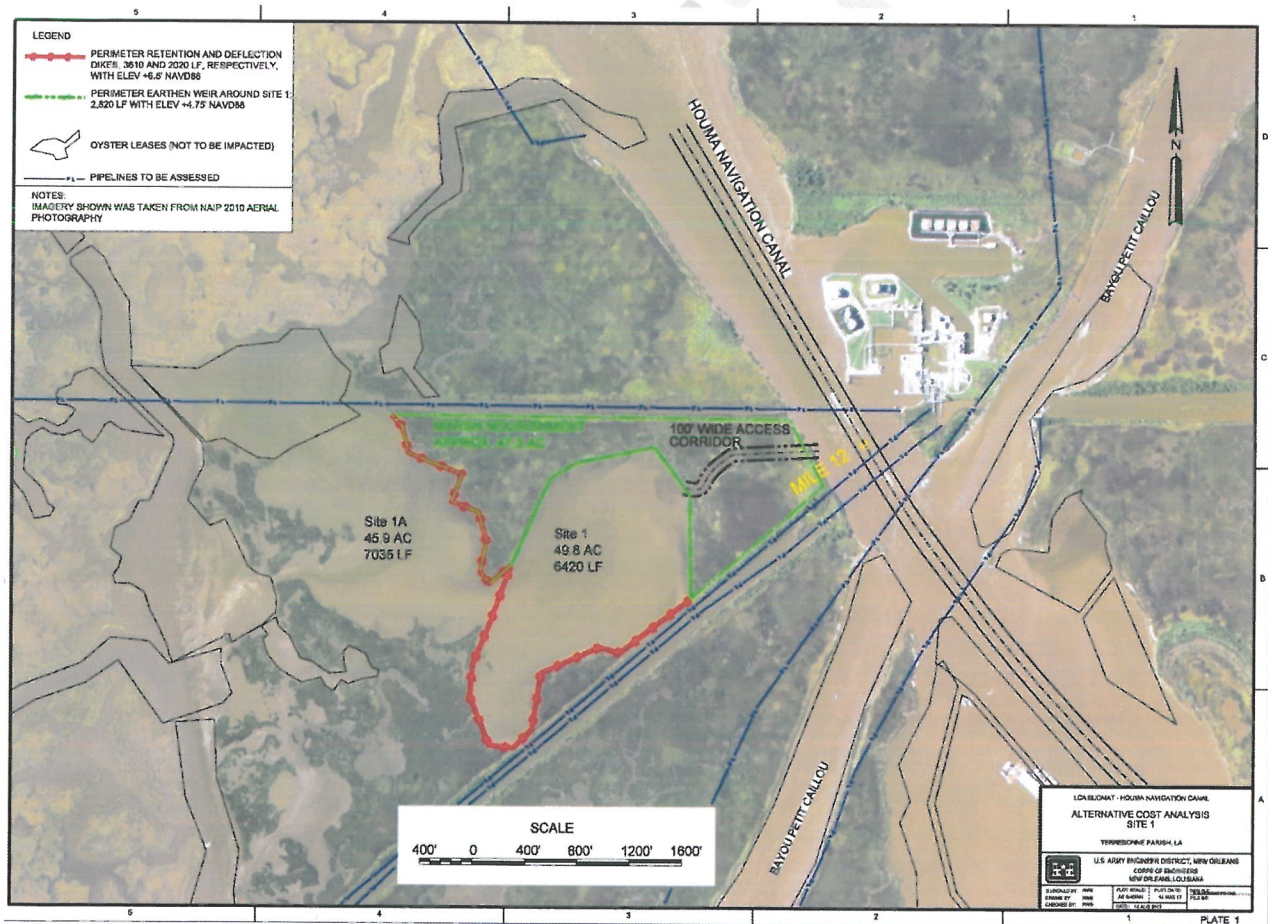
Tentatively Selected Plan (Site 1 Marsh Creation) dike and access corridor plan.
